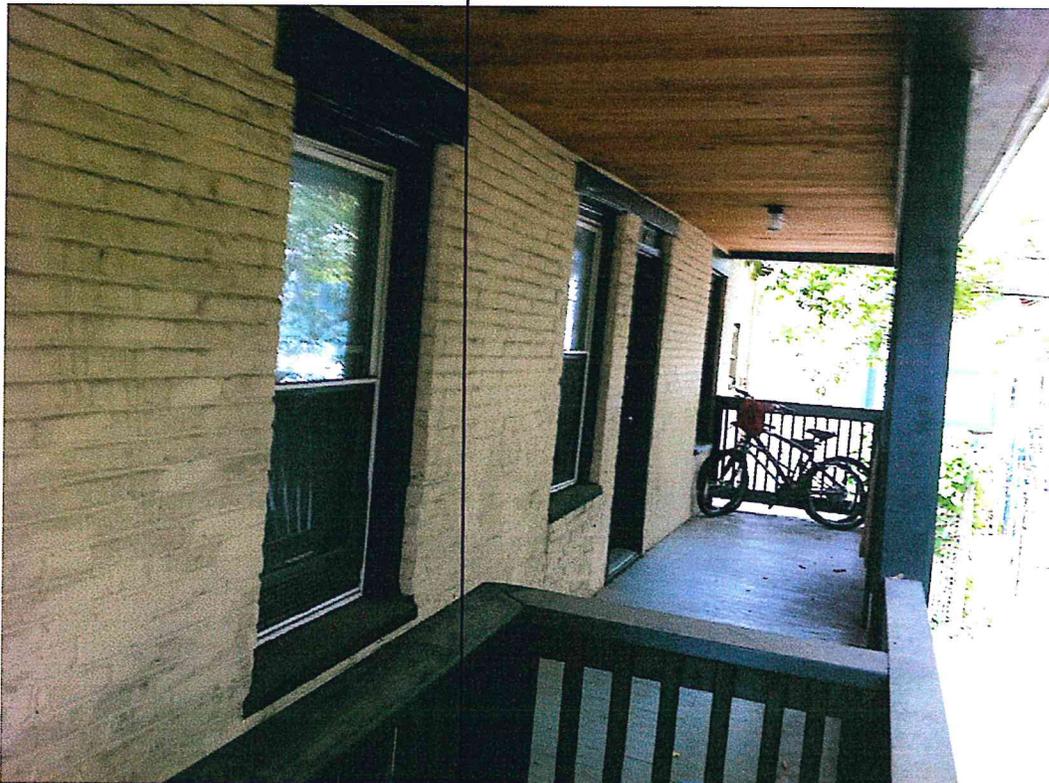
South side at Second Floor of south porch. Windows and doors are at original location with original solid wood headers and sills. Sash and doors are not original.
